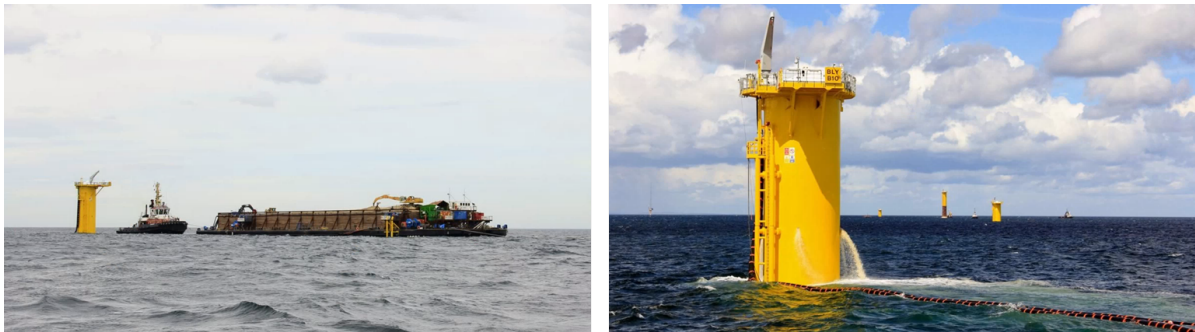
Ballasting equipment during the BOD GBF installation campaign (left). Installed foundation (right) [32].
